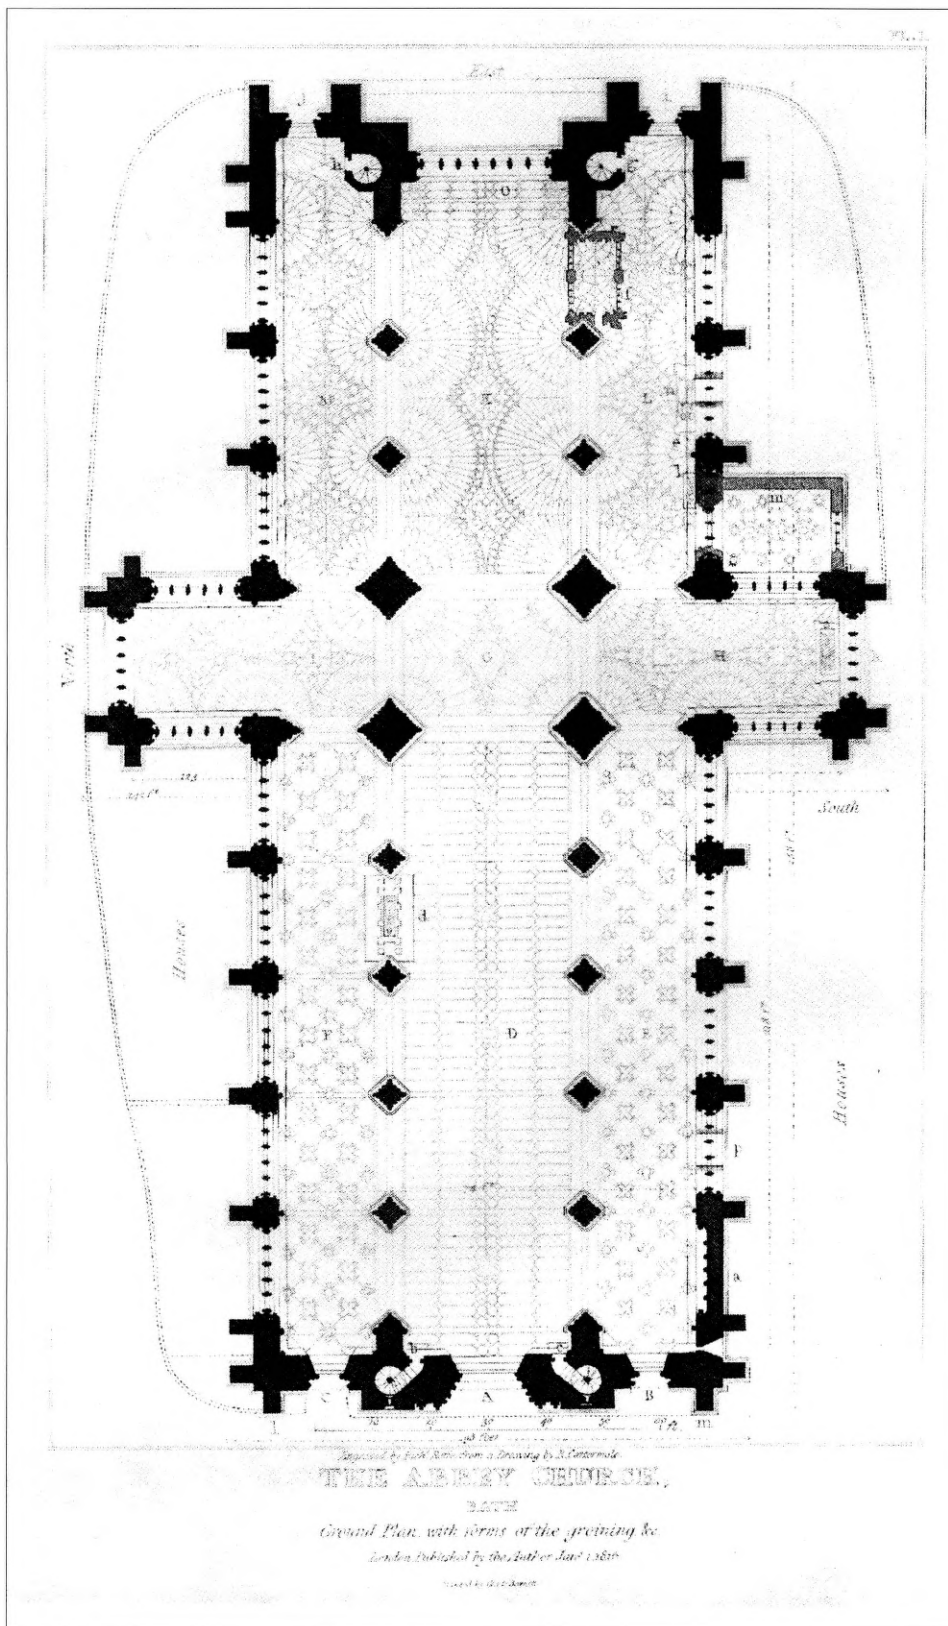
Plan of the late medieval church as constructed occupying the site of the nave of the earlier building
